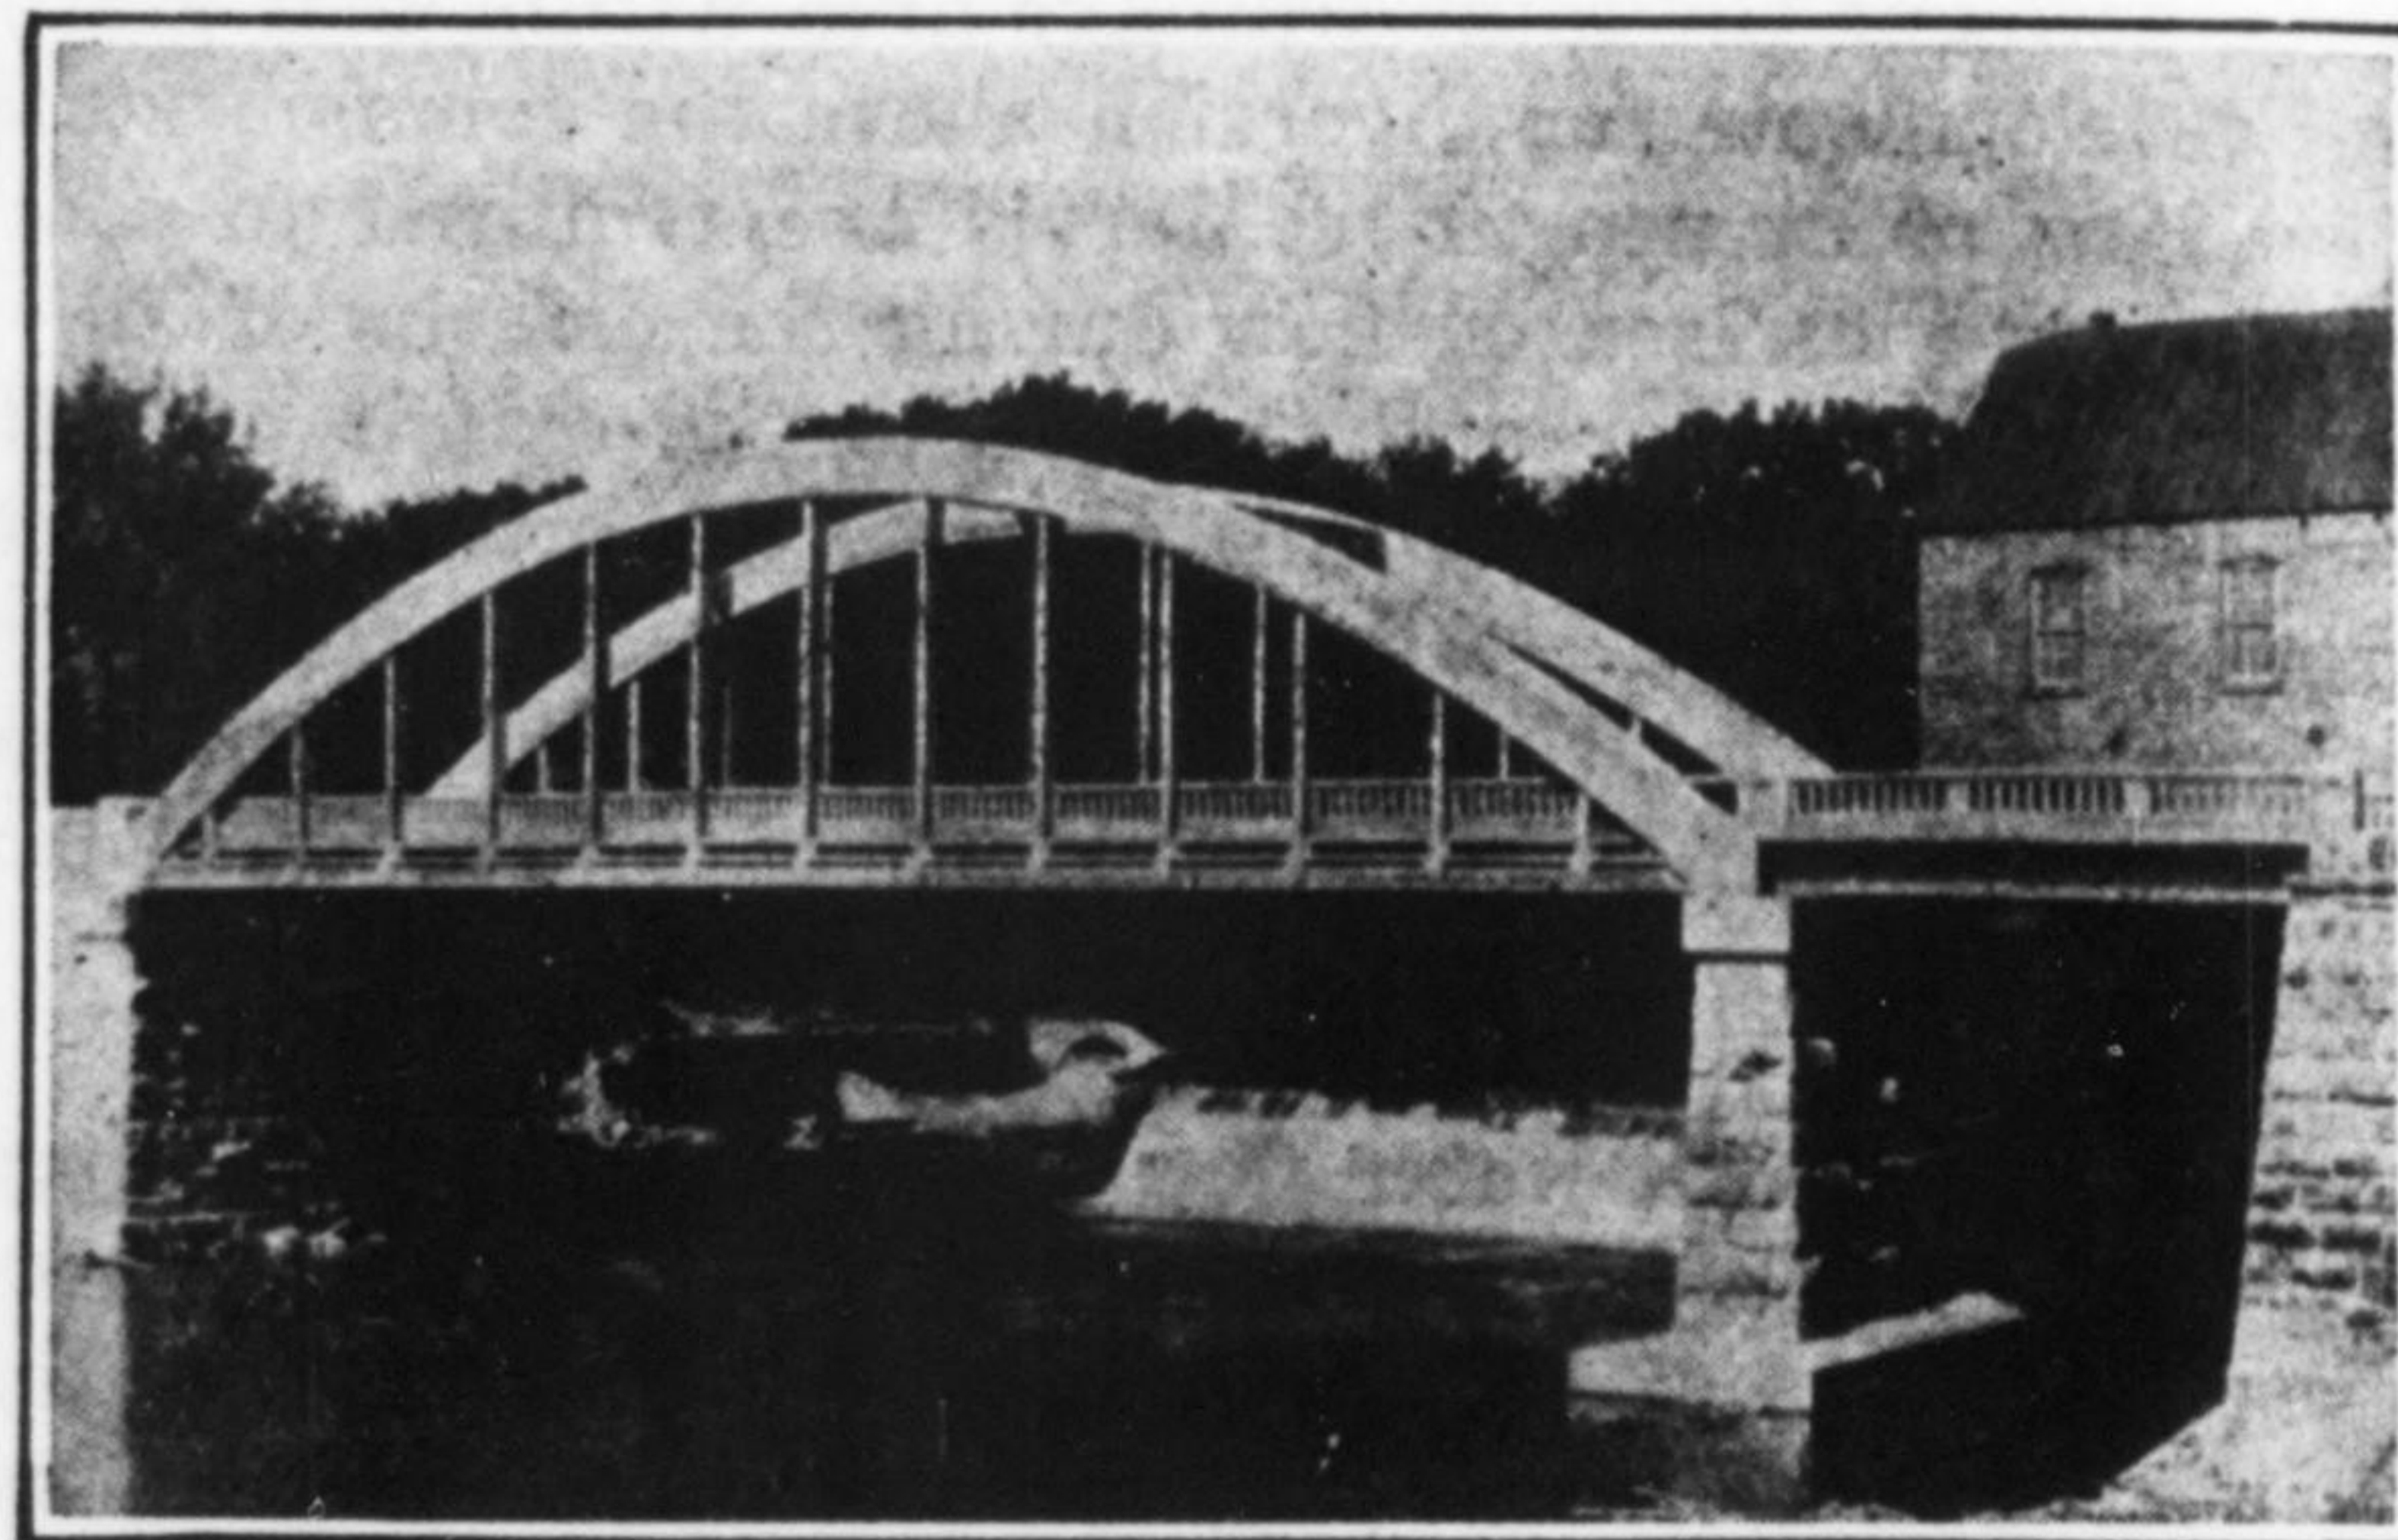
NEW COTTONWOOD RIVER CROSSING—CONCRETE ARCH ON OLD MASONRY
